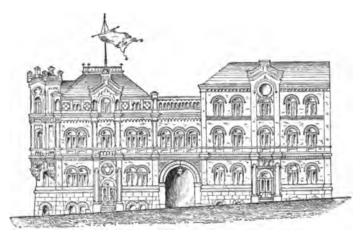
VICTORSTRASSE STATION, BARMEN.
